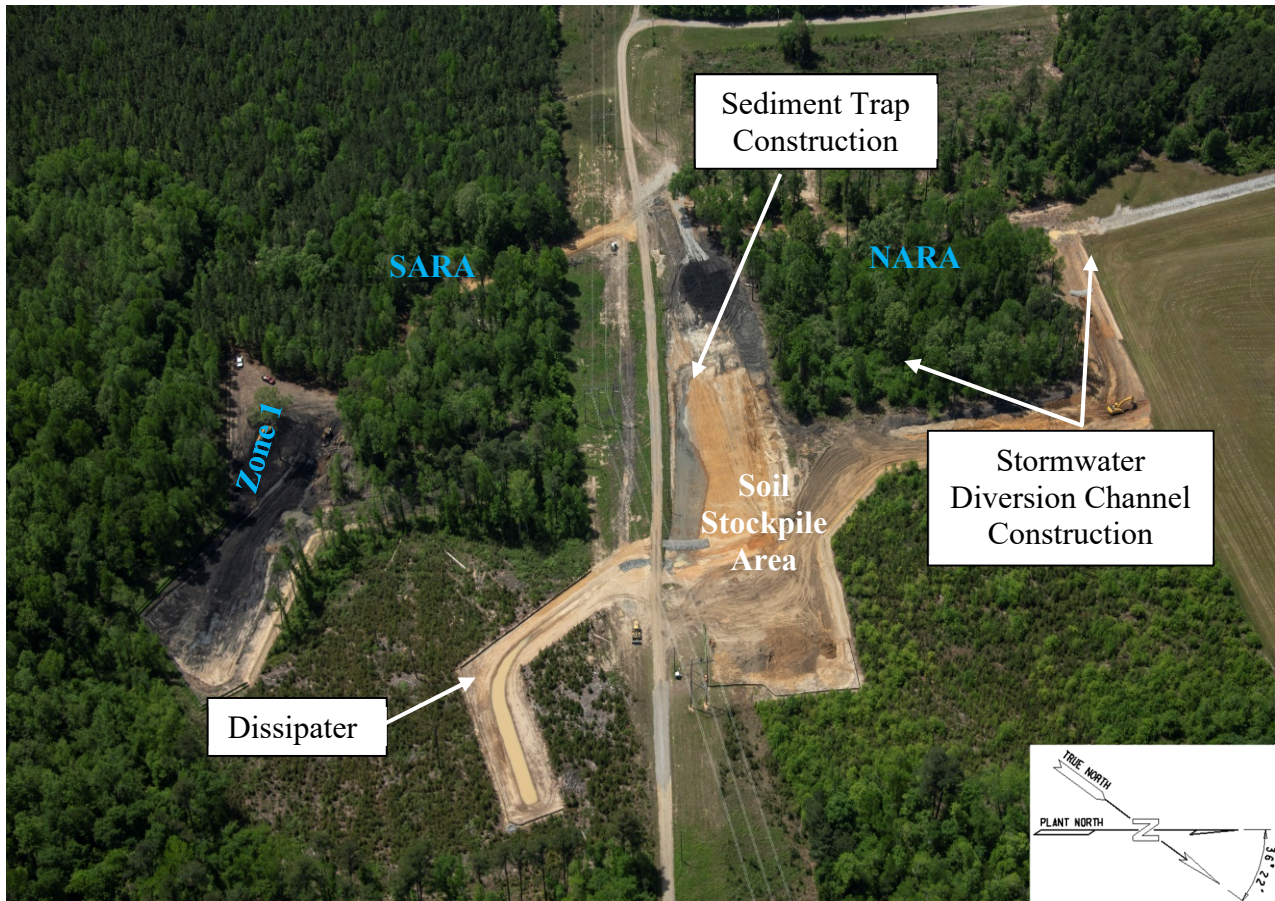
Phase I – Construction of Dissipater and Stormwater Channel/Sediment Trap
